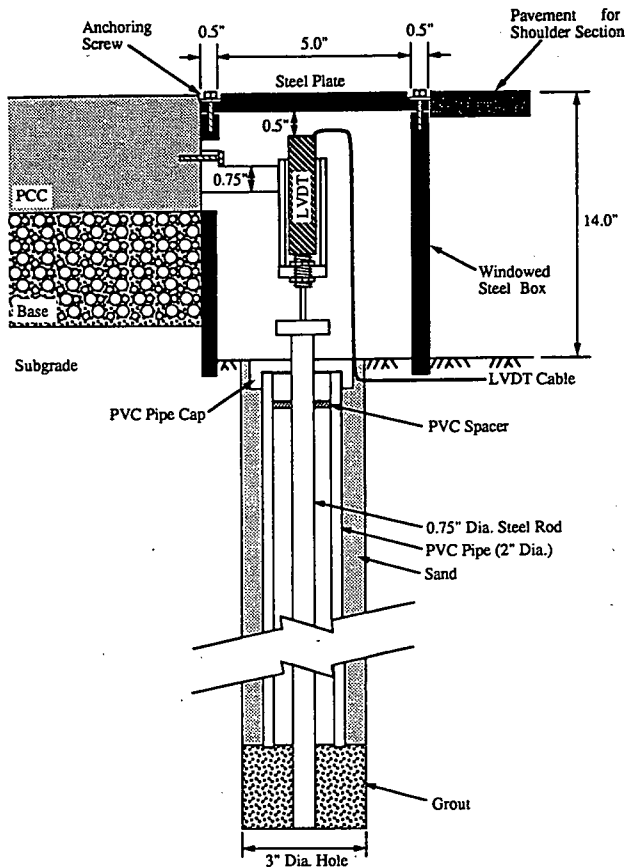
Slab edge joint single layer deflectometer for concrete pavement (31).
